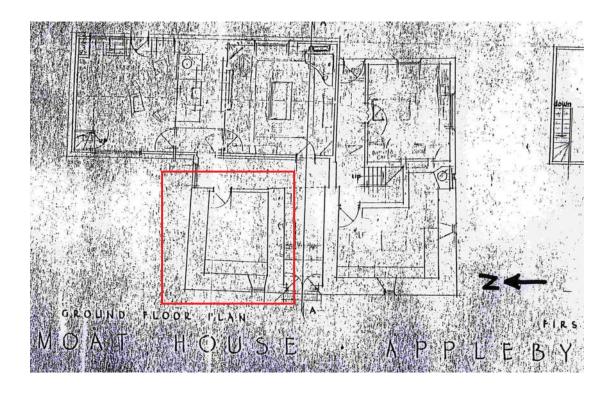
Ground floor plan showing location of bathroom (not to scale)
